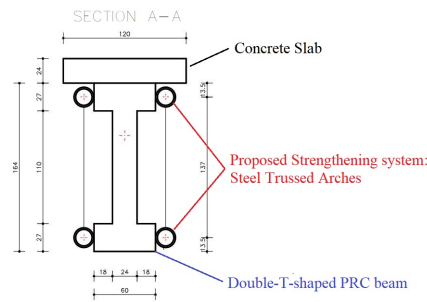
Transversal section at midspan of both PRC beam and strengthening system. Dimensions are expressed in [cm].
